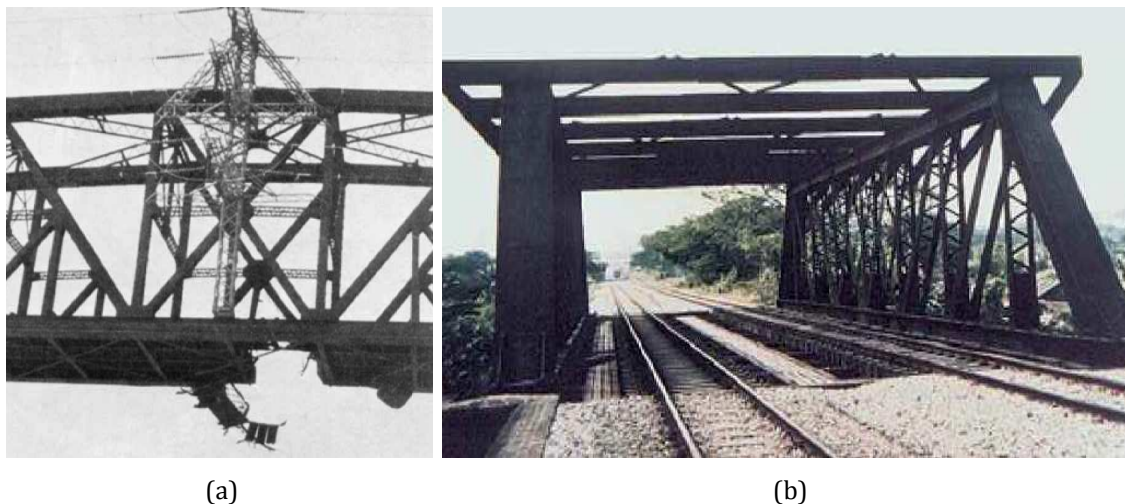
Rehabilitation projects of steel bridges in Asia: (a) damaged structure due to a missile attack; (b) railway truss bridge unfit to sustain new vehicles (Ghosh and Ghoshal, 2002).
